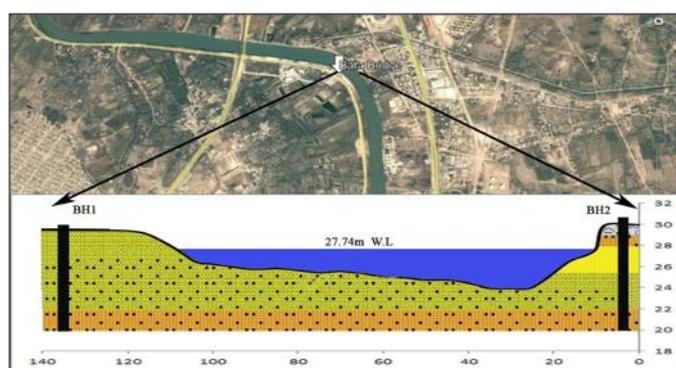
River cross section showing boreholes, and Soil layers of Bata Bridge station
